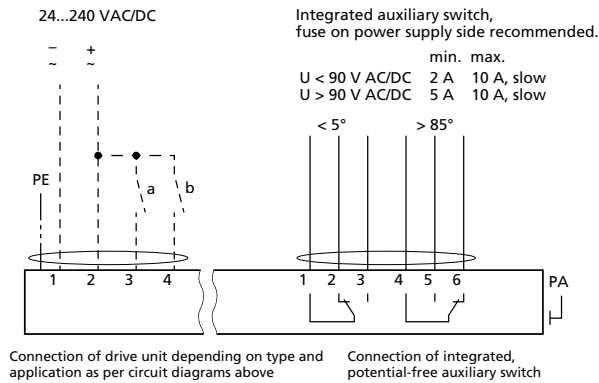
SB3.0 - Wiring of actuator acc. to SB 1.0, SB 2.0 or SB 2.1 / cable type 6, cable diameter 7.4 mm
